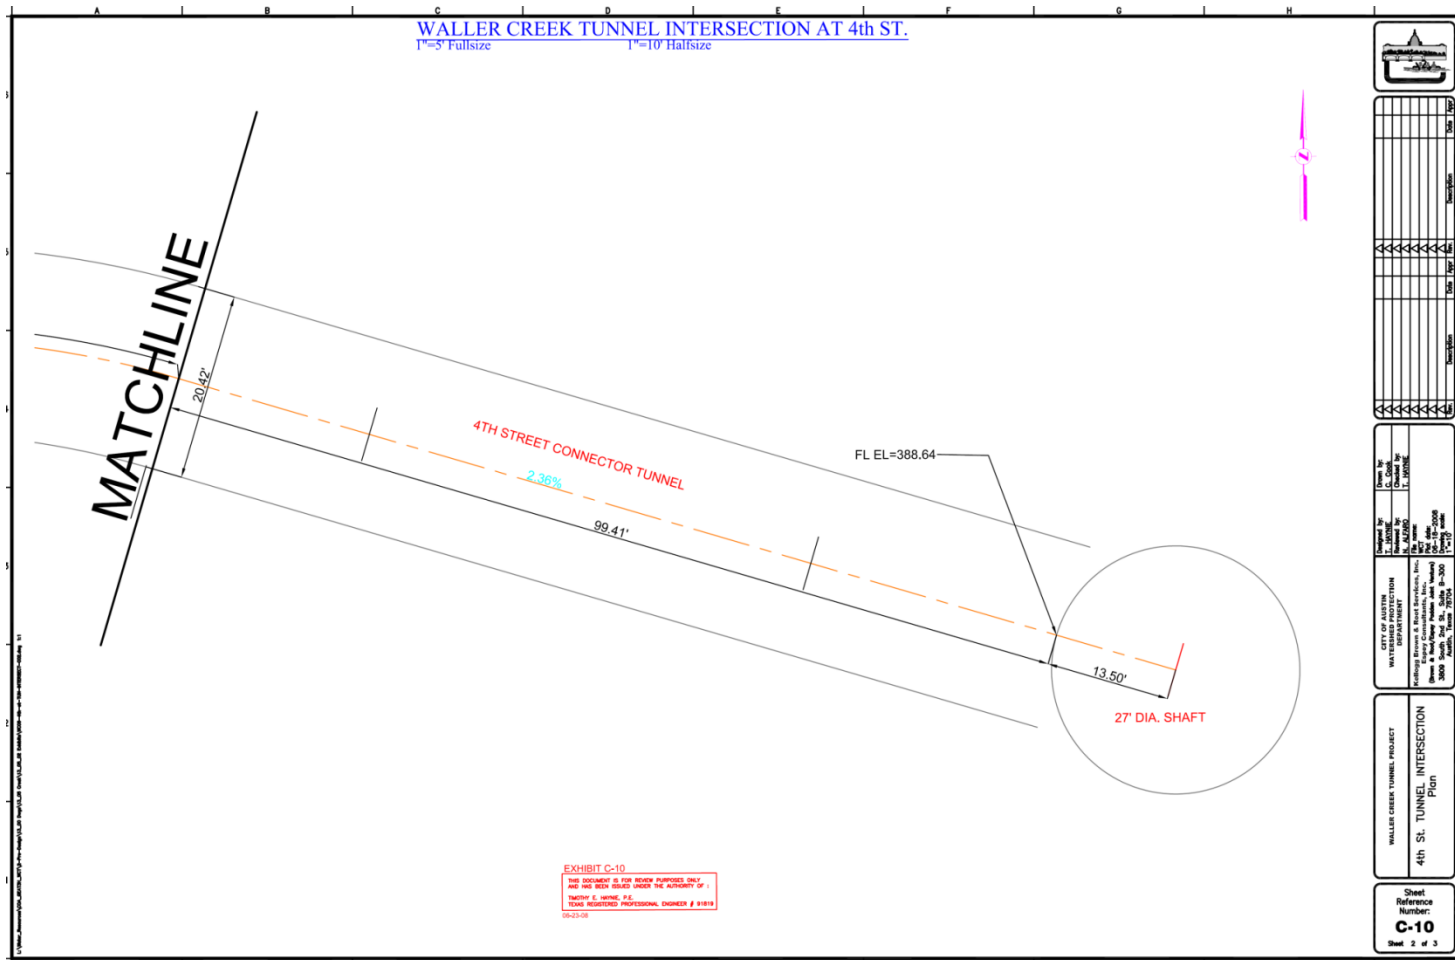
Waller Creek Tunnel Project; Tunnel Intersection at 4th Street-Plan
